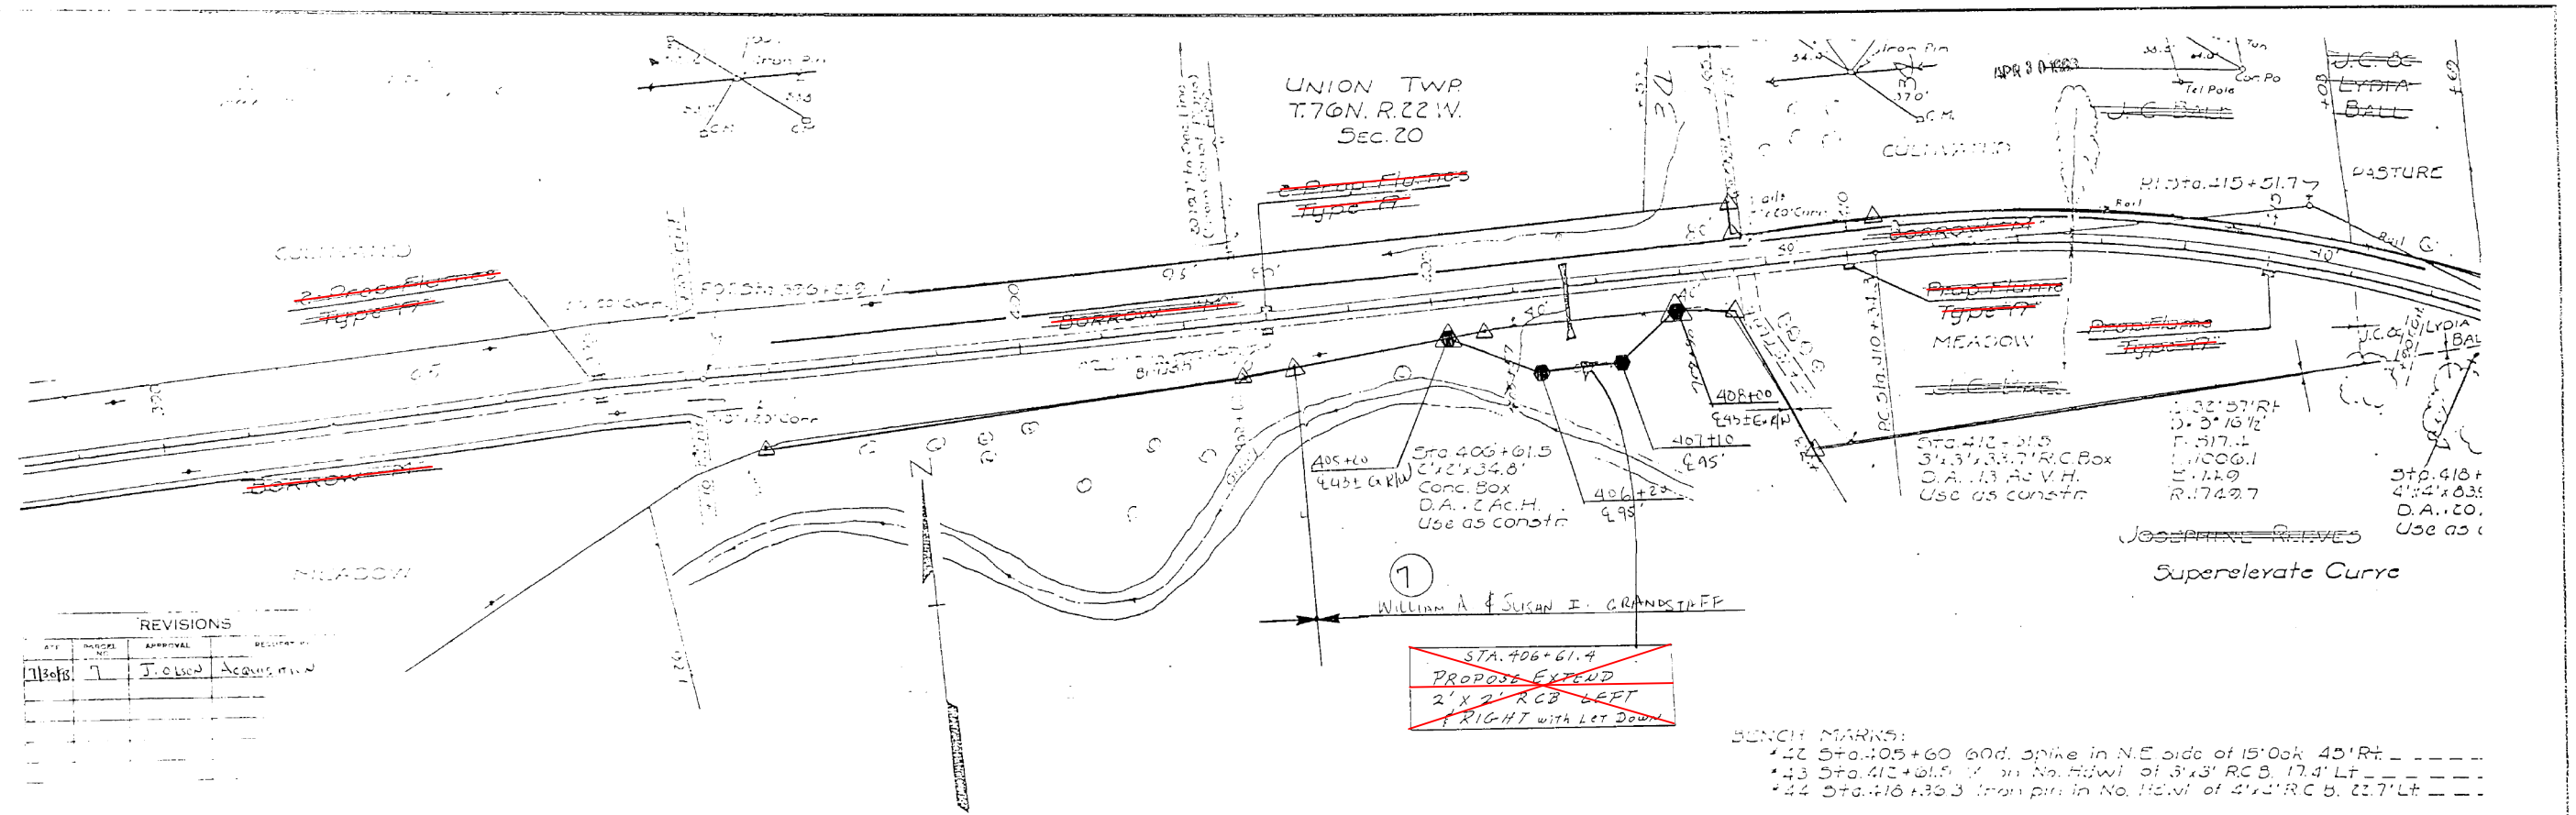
PLAN PROFILE O. P. R. & E. STANDARD
